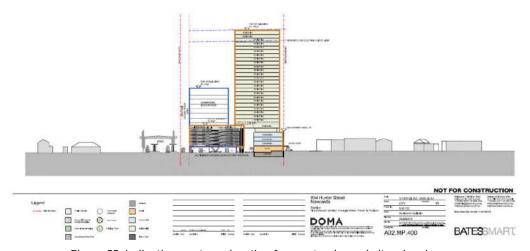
Indicative western elevation for masterplanned site, showing crosssection of proposed towers. Bates Smart
